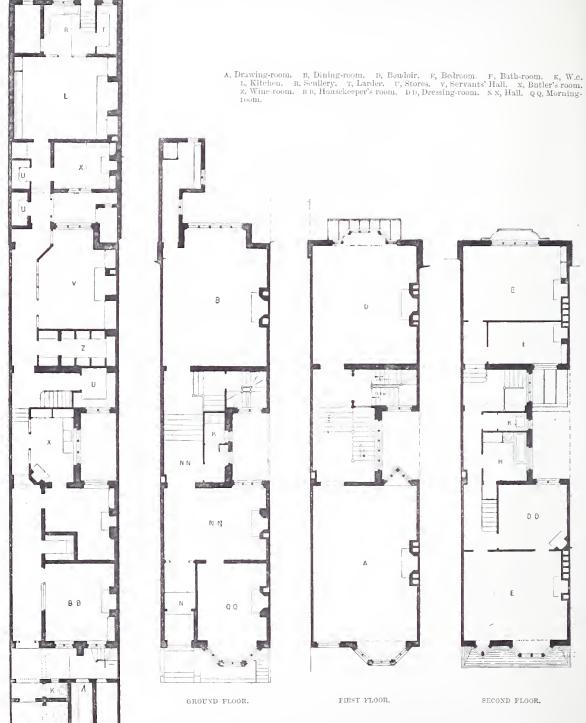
PLANS OF A HOUSE IN CADOGAN SQUARE. EDWIN T. HALL, ARCHITECT, 1890.
